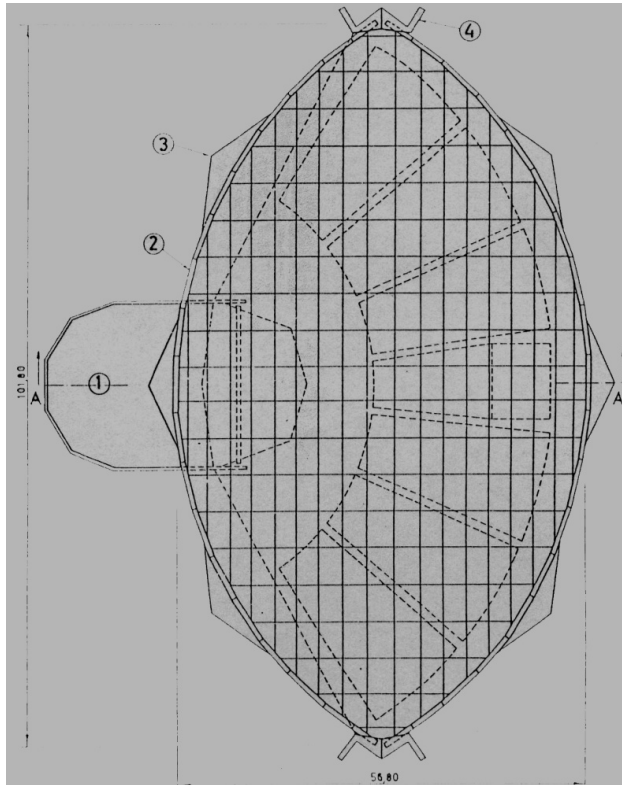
Supporting structure of construction of roof in orthogonal projection on horizontal plane, marking as shown earlier
